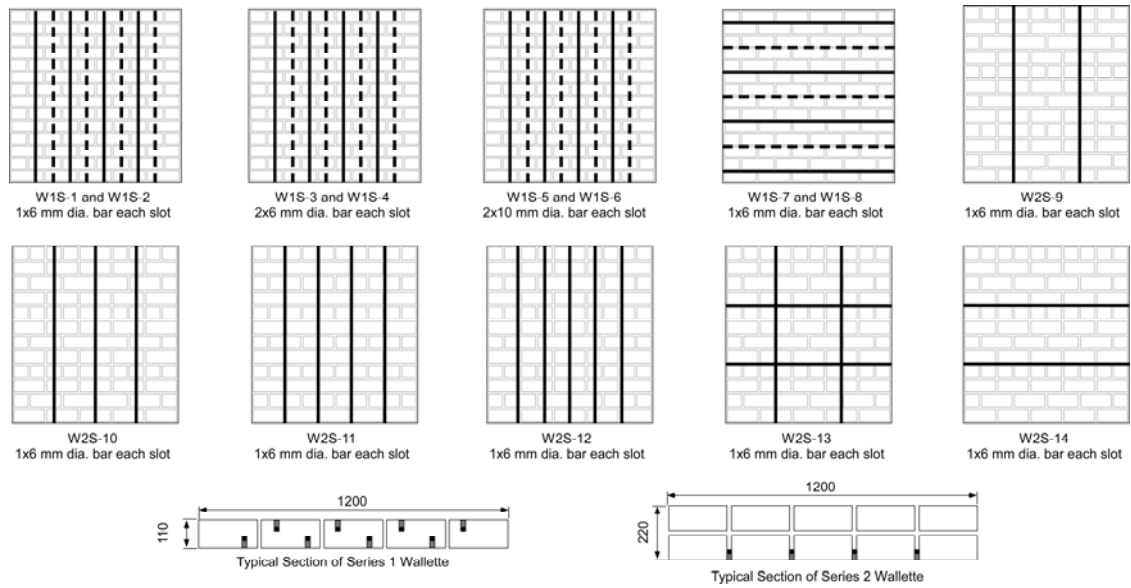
Strengthened wallette details from Ismail et al. (2011) [2]
